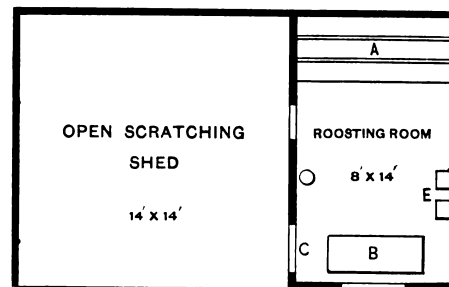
Floor Plan.—Scale, 1/4 Inch to the Foot.
